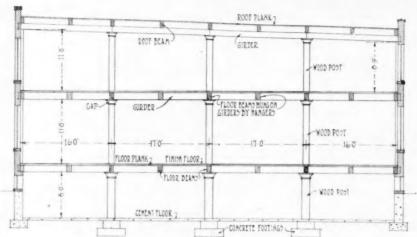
Cross-Section of Small Factory, Showing Arrangement of Posts and Girders.
